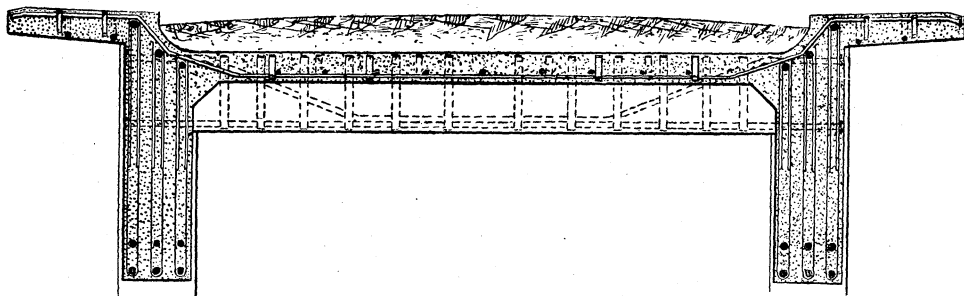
A Cross Section of a Bridge Showing Hennebique System.
